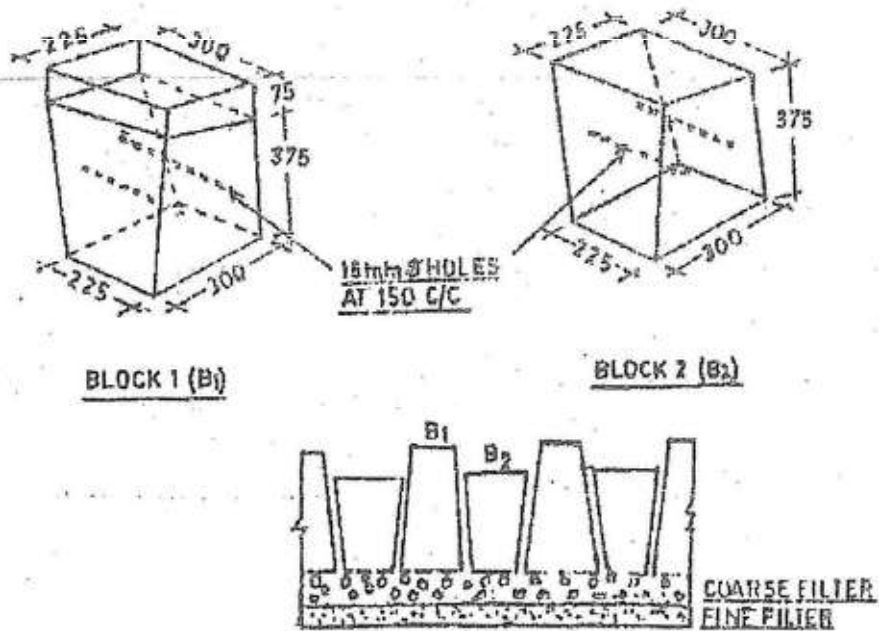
TYPICAL DETAILS OF CONCRETE BLOCKS
